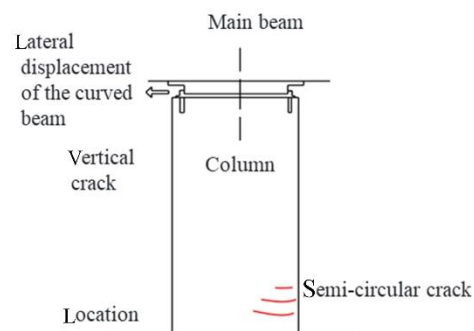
Schematic diagram of crack in bridge pier column
